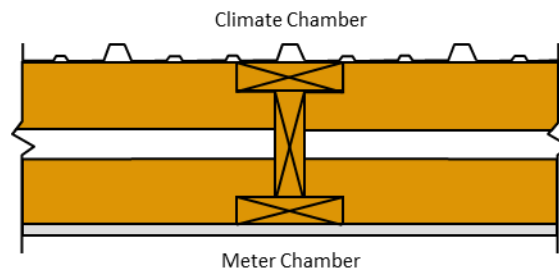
Typical plan view at center of the test wall (offset, inset nominal 2x4 notched girts shown)
